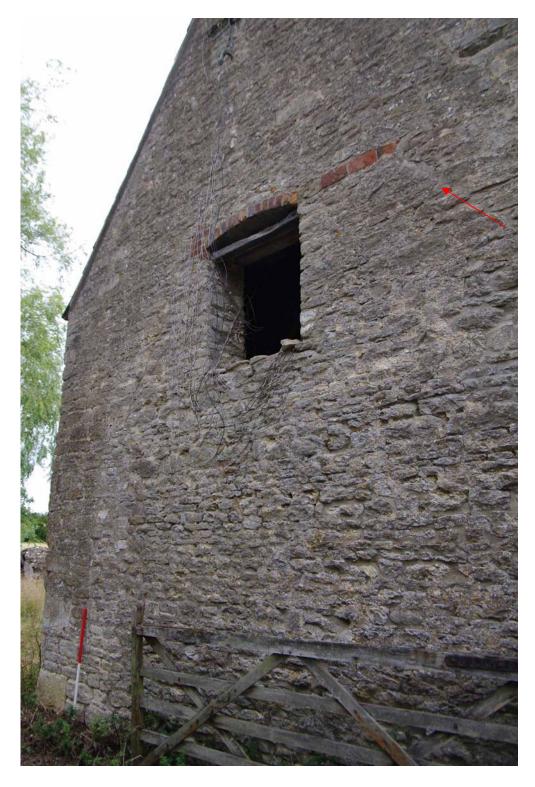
West range, south facing elevation of building A Looking north west. Note joint of earlier gable (arrowed), 1m scale marks the vertical joint of the earlier gable wall
